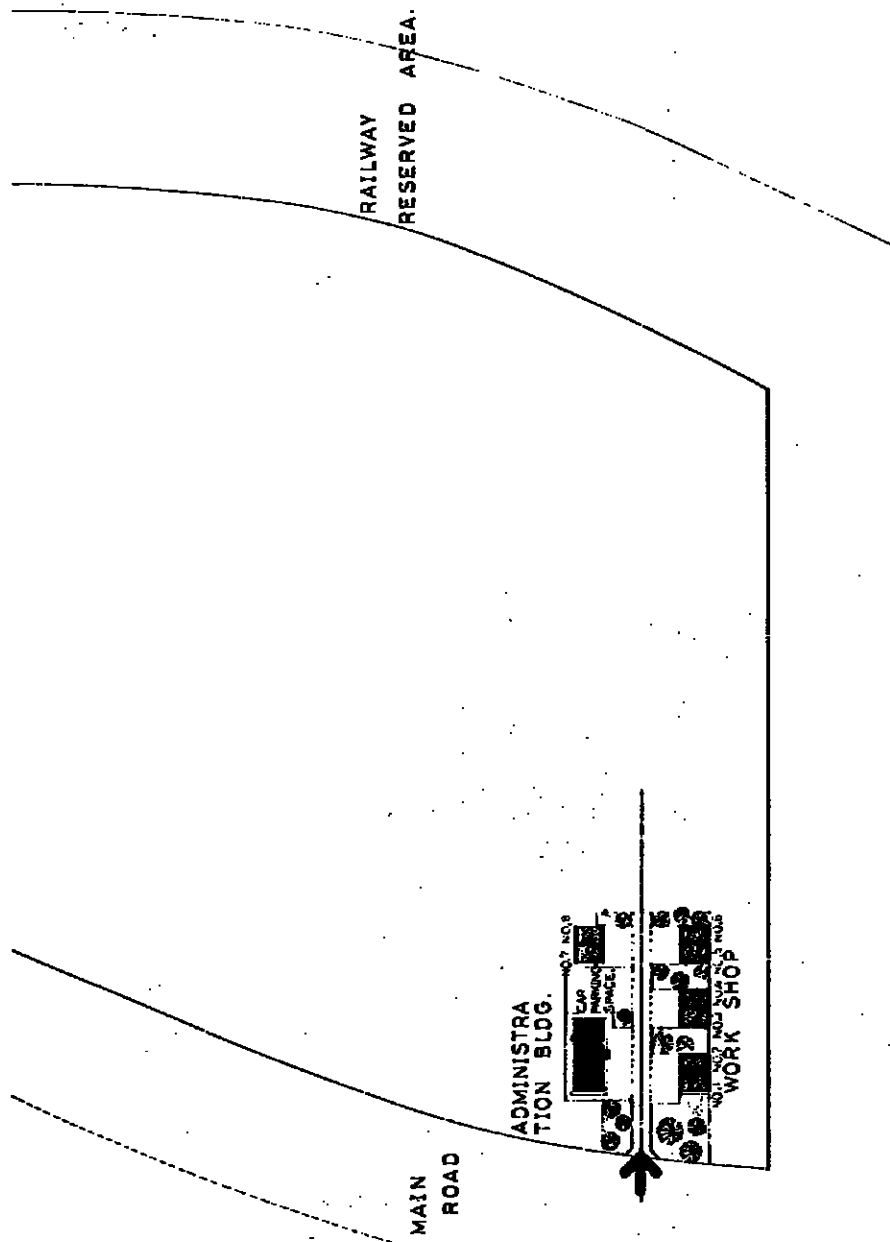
R.I.D.C. NYAFURURU PLOT PLAN.
